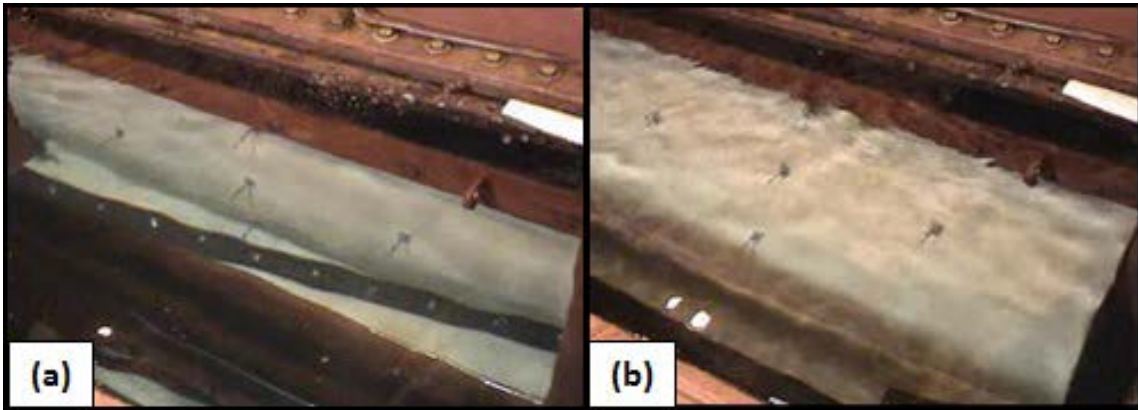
SW5. (a) Failure of mechanical anchorage on Wall SW5. (b) Adhesive bond failed after the mechanical anchorage failed.
